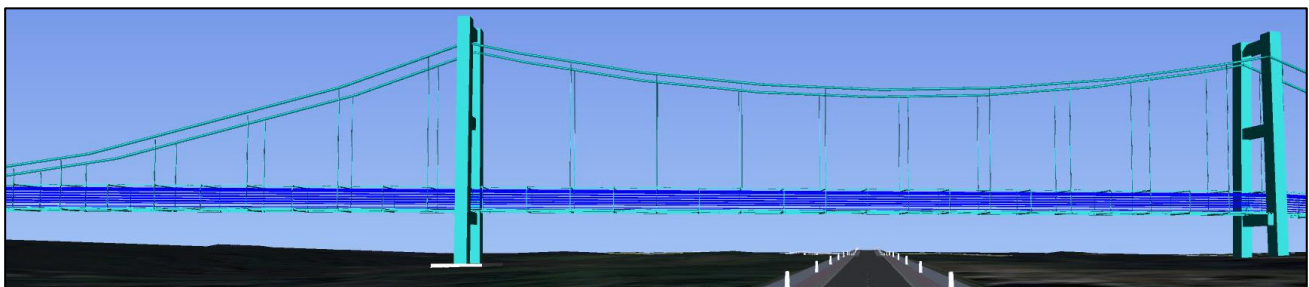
Graphic 3D representation of the catenary bridge structure from which the pipe and cabling bridge box structure is to be suspended for spanning over the mangrove and indigenous serral forest patches/ stands.
